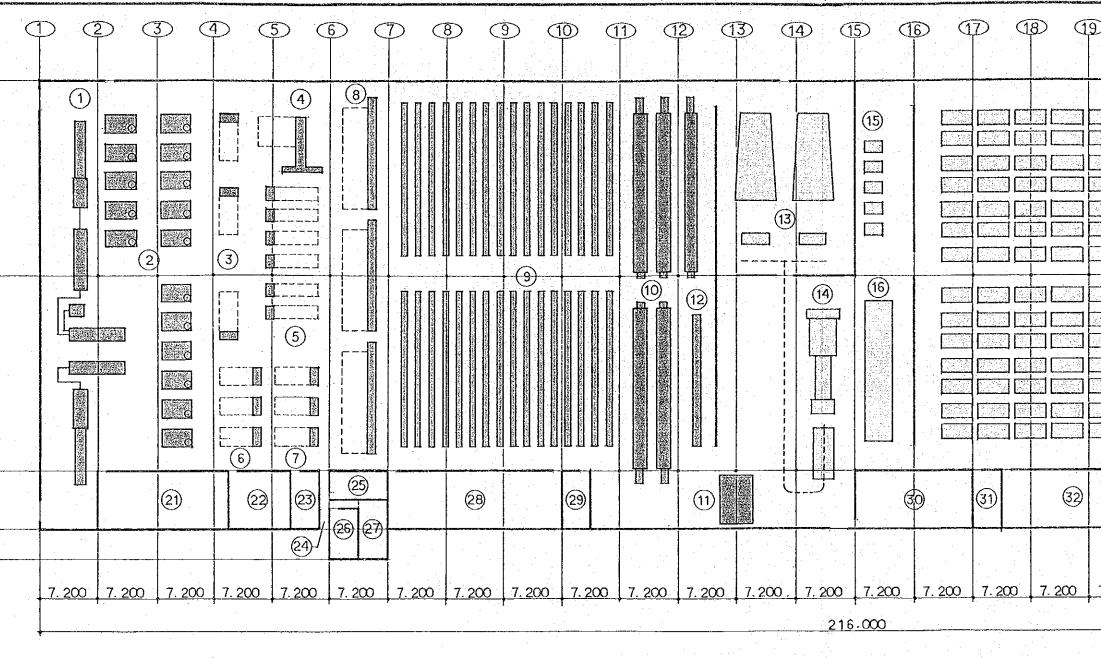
Layout of Production Machinery (Spinning · Weaving)
